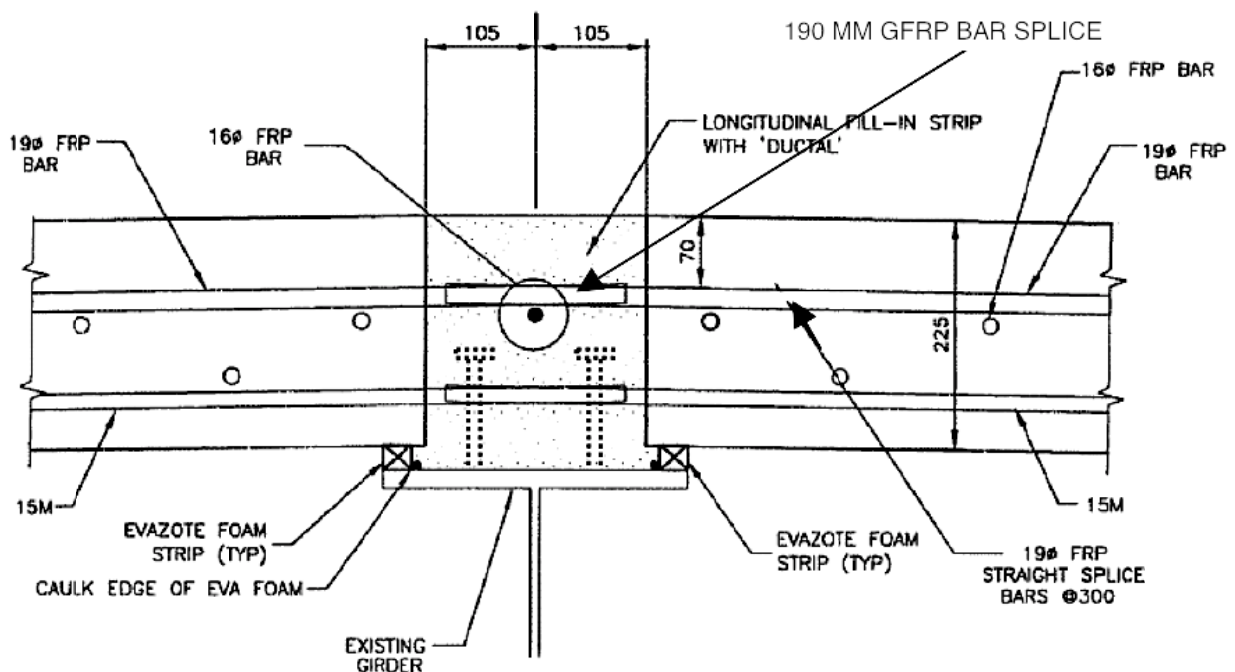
Details of the longitudinal bridge deck joint at Rainy Lake, Ontario (Perry et al. 2007)
